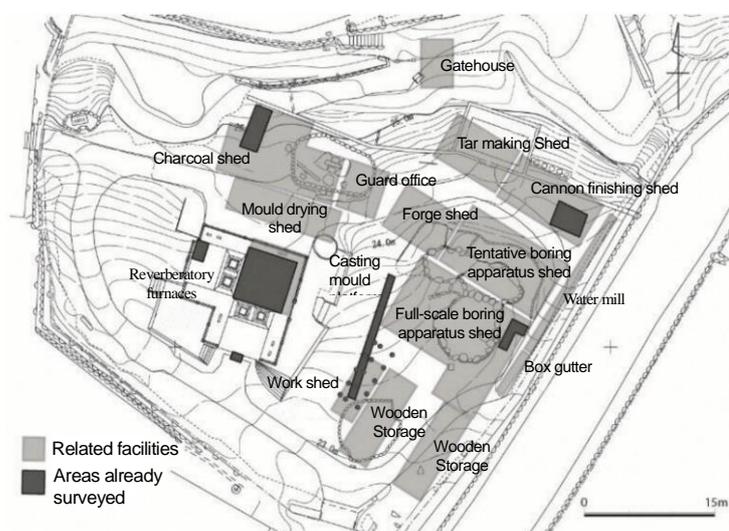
Ground plan showing locations of related facilities created from old pictures and areas excavated in past surveys
